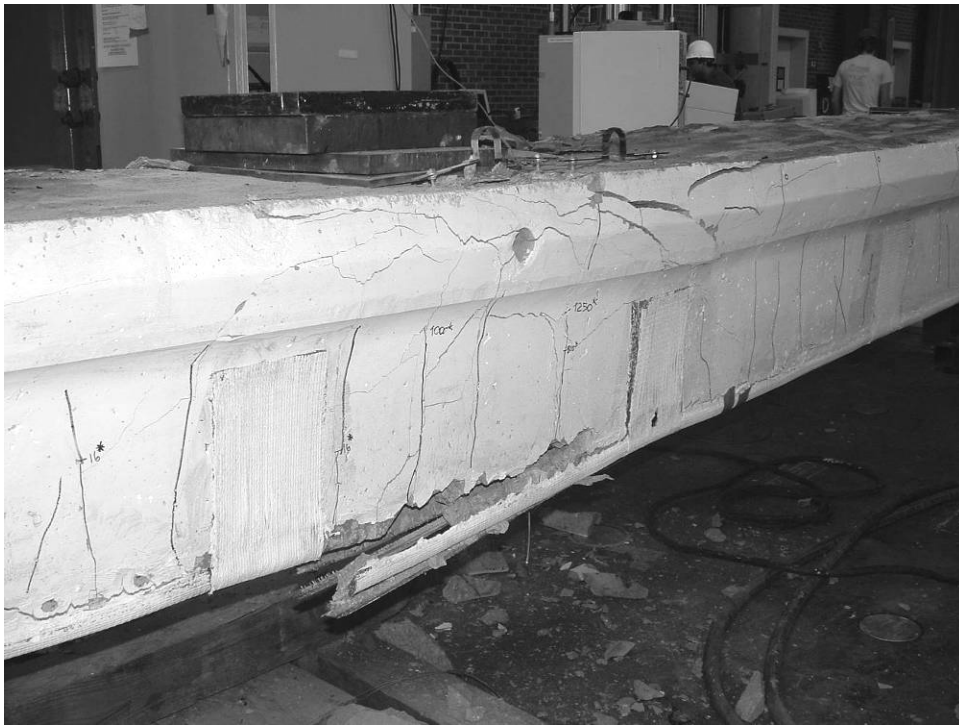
Girder EB4F after failure due to concrete crushing followed by rupture of CFRP
